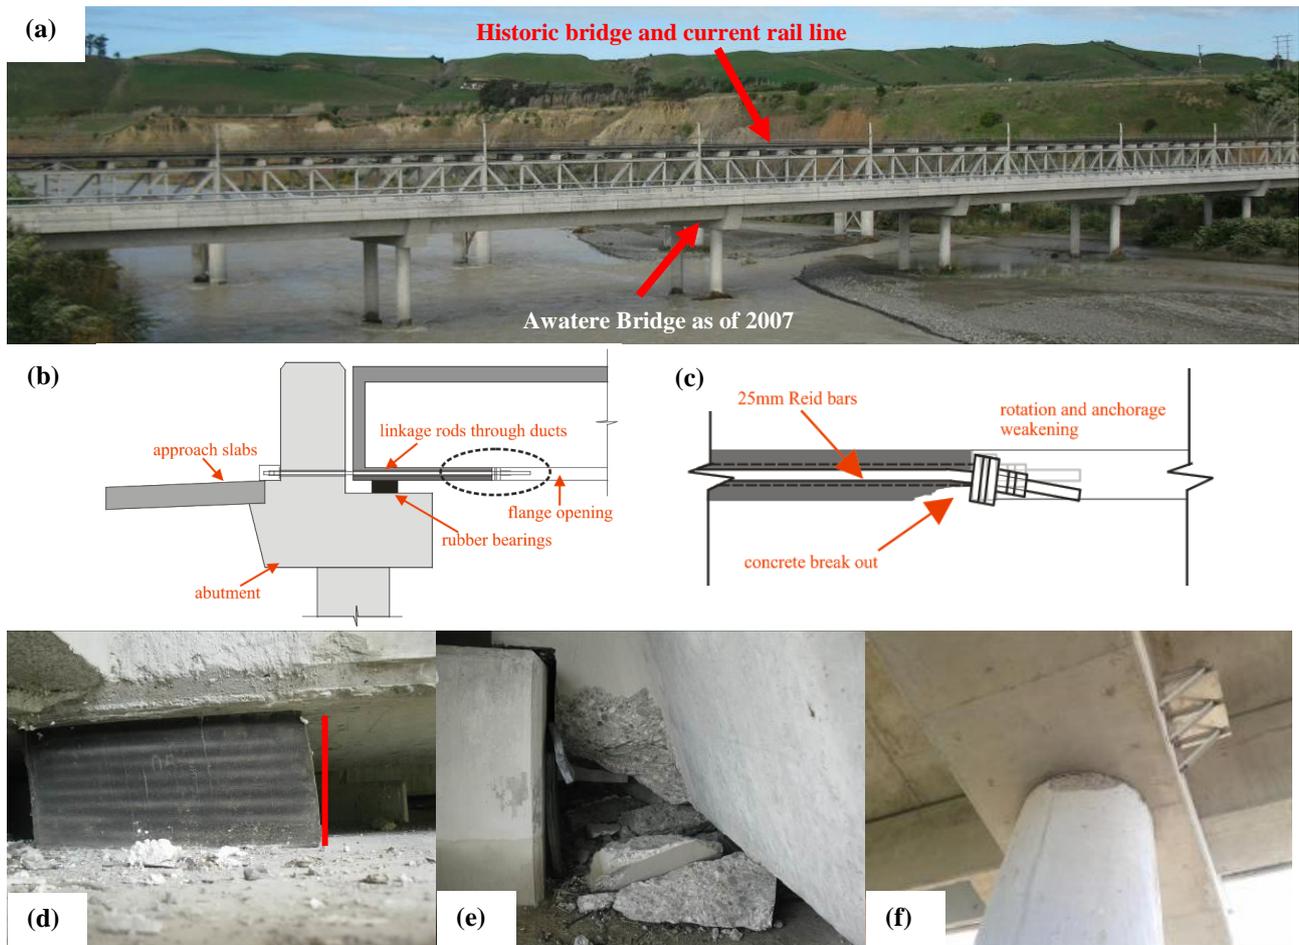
(a) The 275 m Awatere Bridge; (b) details of the abutment-diaphragm connection; (c) post- 21 July damage at north abutment. Post-16 August damage; (d) rubber bearings indicate residual longitudinal displacement; (e) spalling of cover concrete at edge of U-beam girders and; (f) spalling at central piers (last image courtesy of NZTA [13]).
